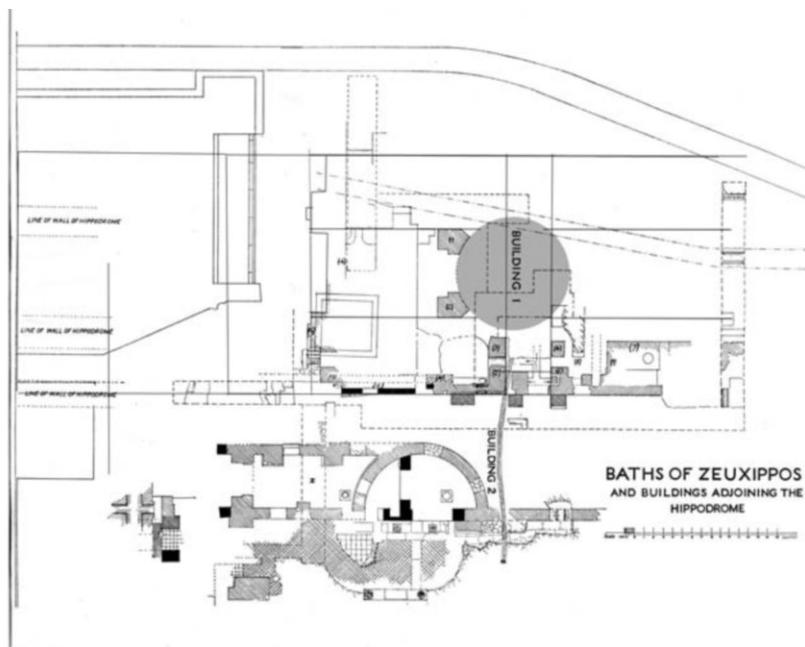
Plan of structure to west of Baths of Zeuxippus (author), based on plan of “Building 1”, S. Casson, *Preliminary report on the excavations carried out in the Hippodrome of Constantinople in 1927 on behalf of the British Academy* (London 1928). Plan shows curvature of pier structures, and likely alignments of side walls.
